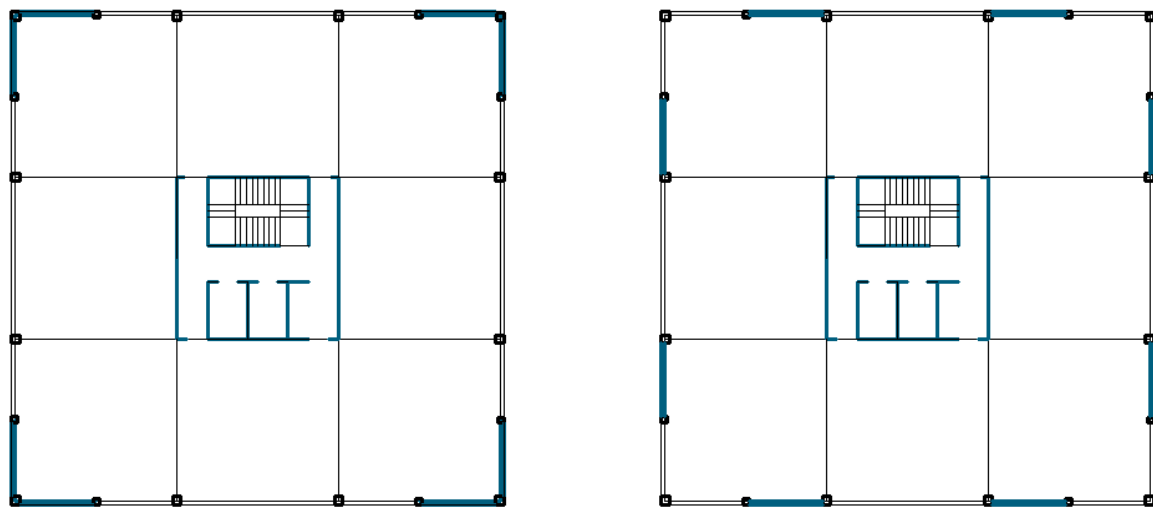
Alternative of quadratic building configuration with plan dimension 24x24m: left – structural plan with eight perimeter perforated structural walls 4m wide placed in the corner of the buildings maintaining the same service core in the center and with a grid of much more enlarged columns; right – structural plan with eight perimeter perforated structural walls 4m wide placed in the different part of the building perimeter (source: the author)
